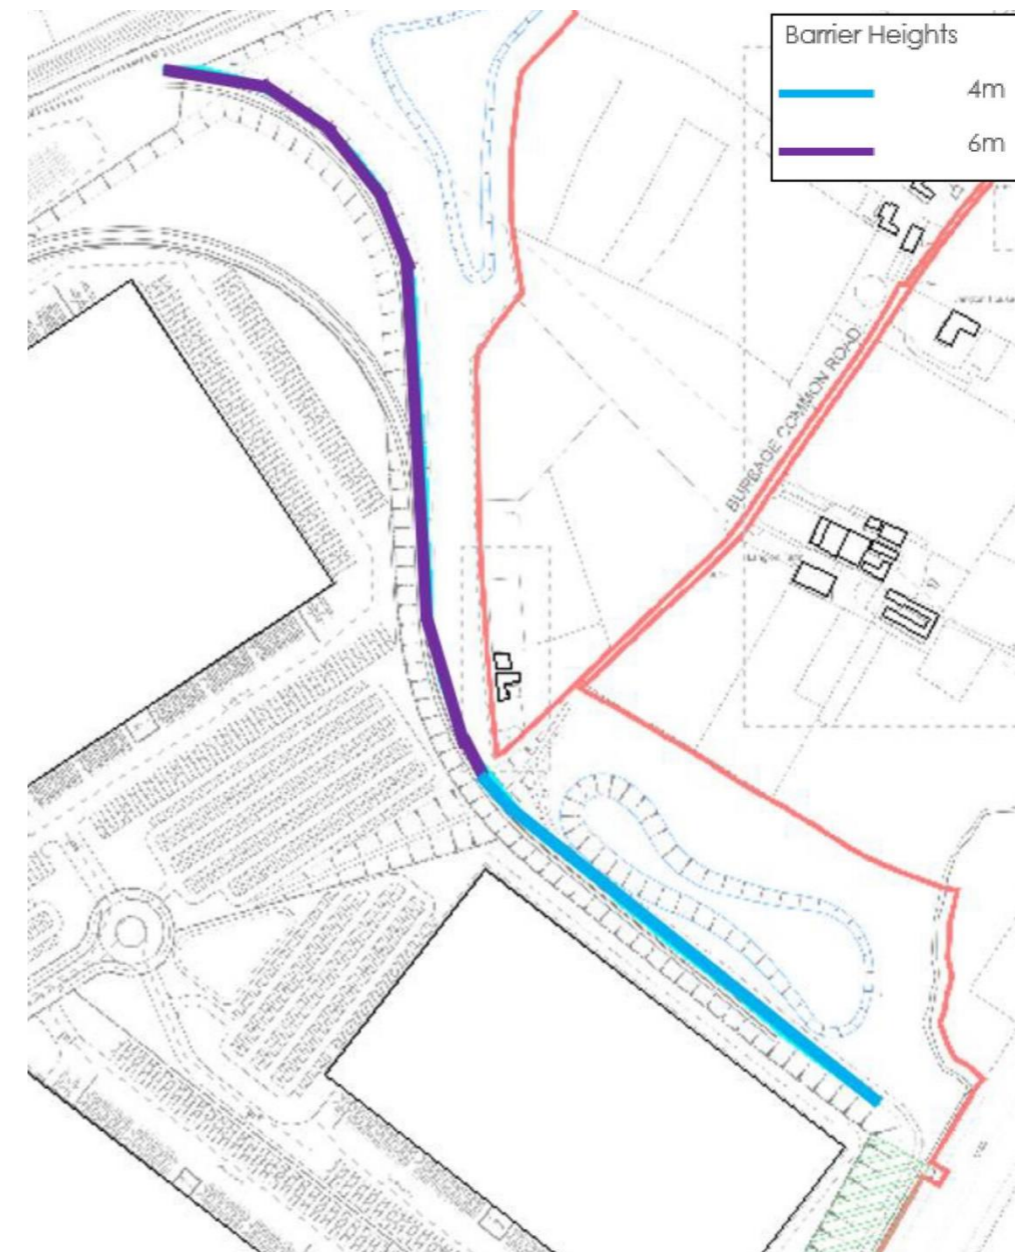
Proposed Noise Barriers to north east of Head Shunt.
